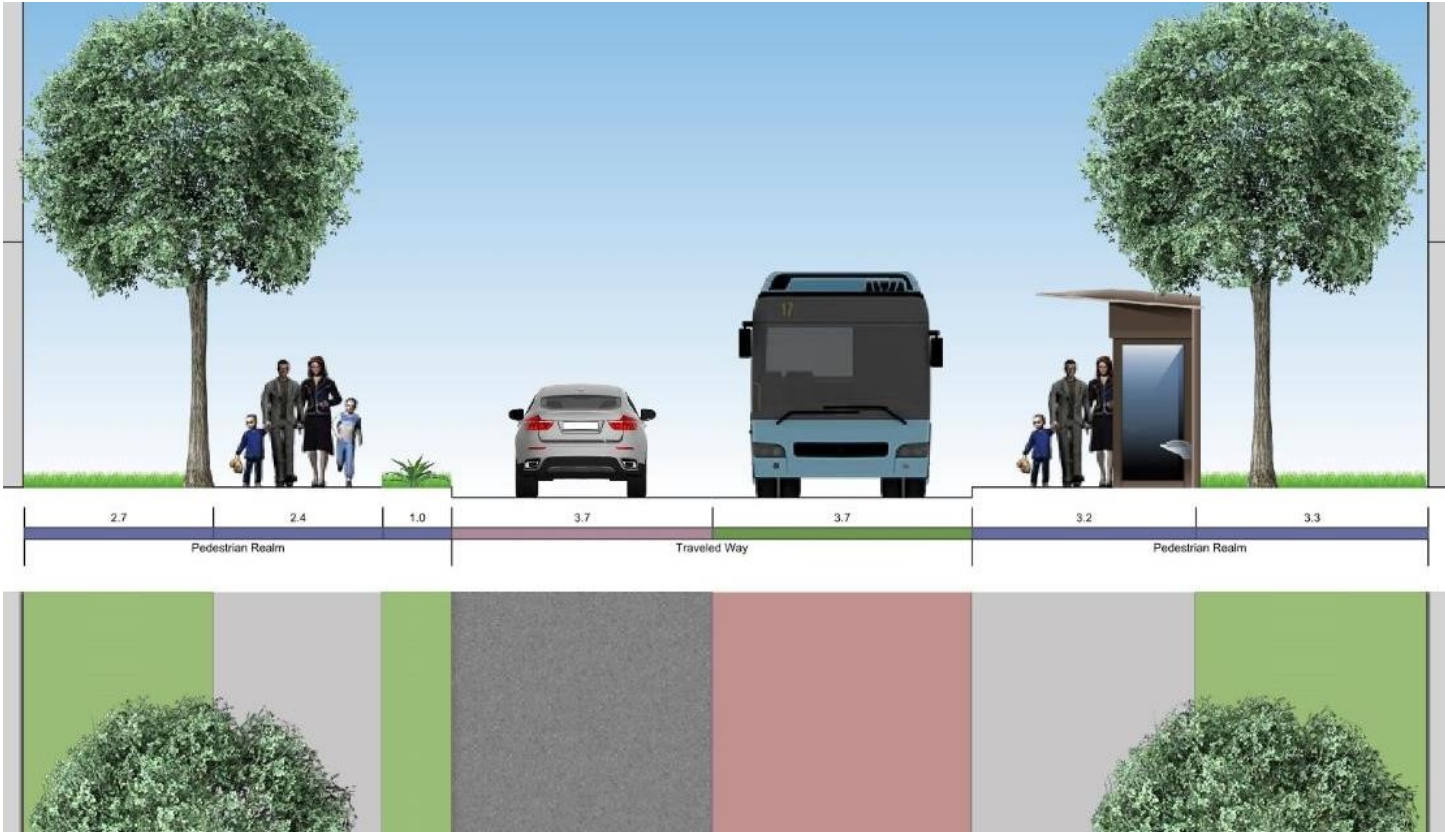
Indicative 20m reserve with Bus Route and parking - Stanton Road / Second Street and New Road 2
